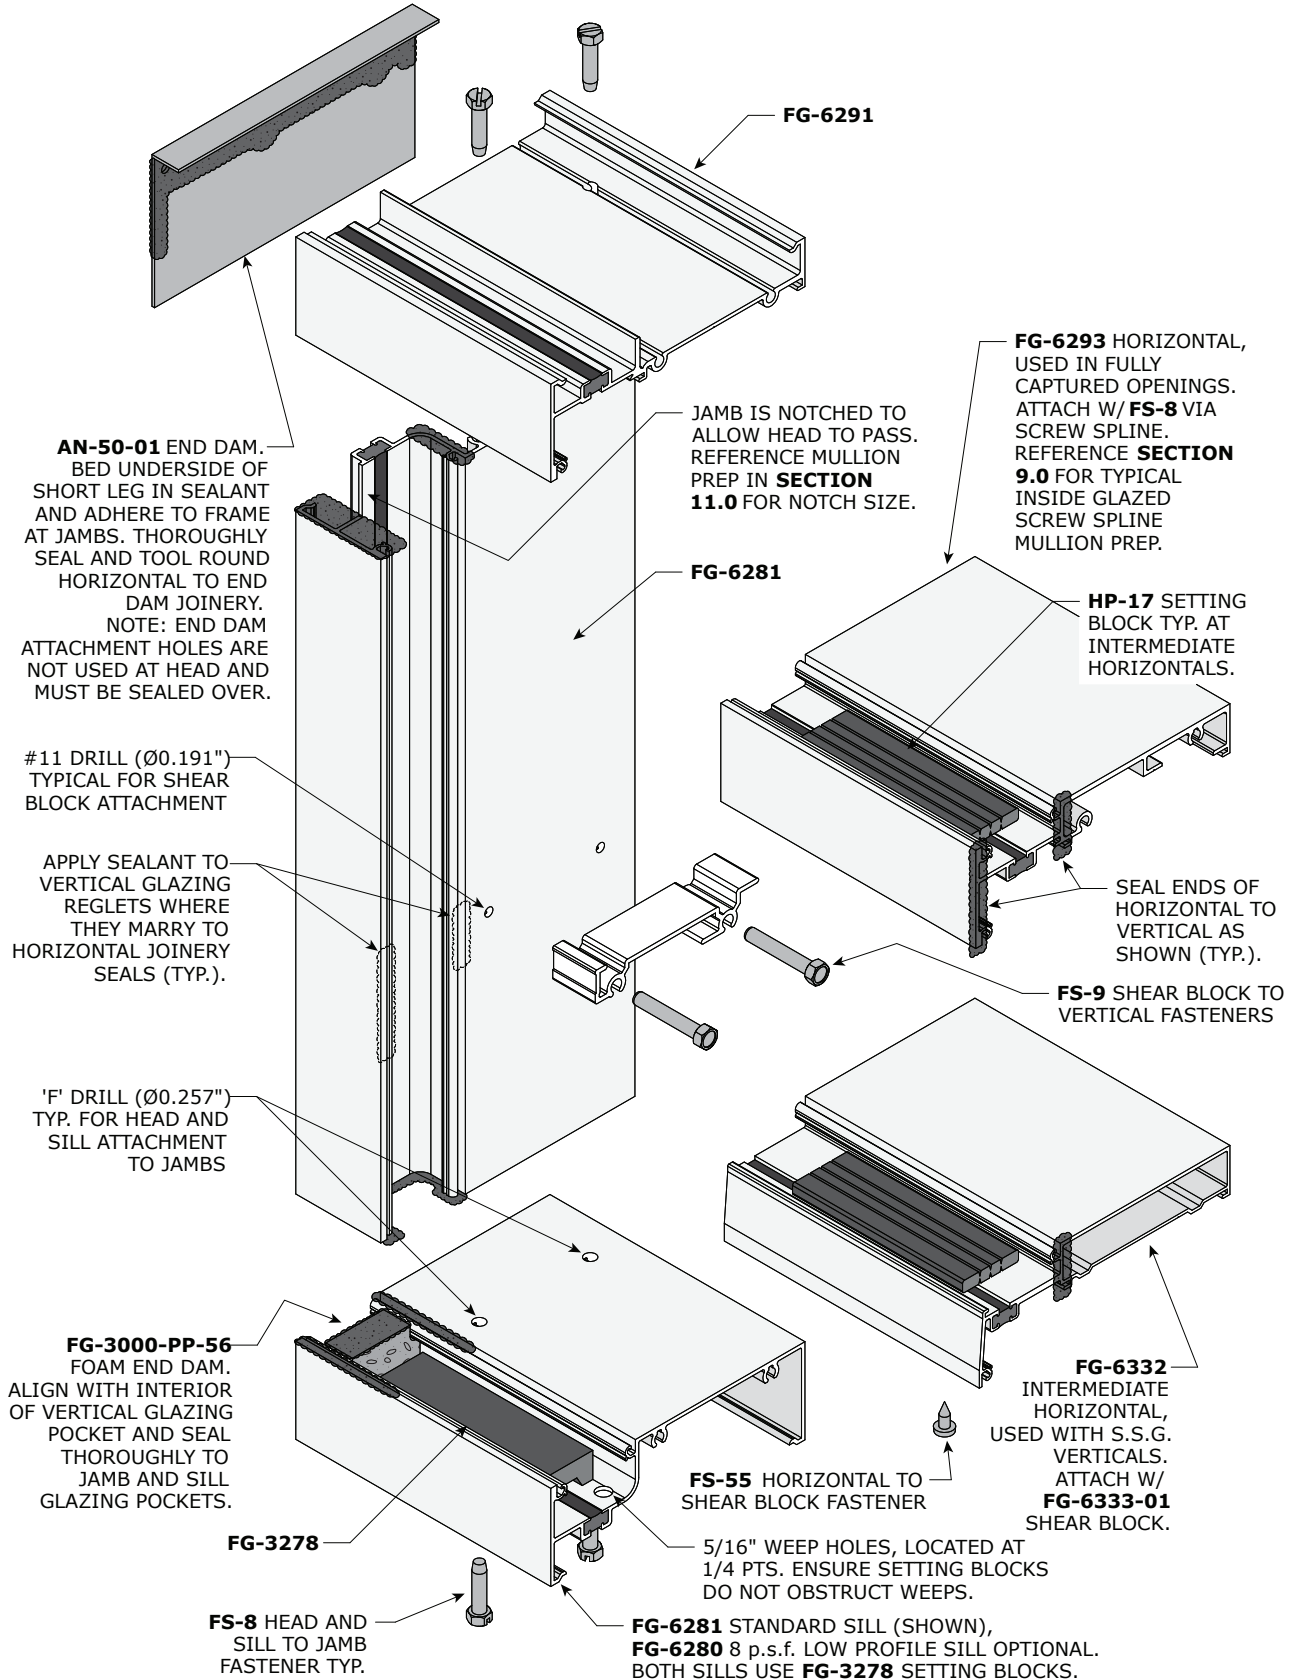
Jamb Frame Assembly - Front Set, 2-Sided S.S.G. System
